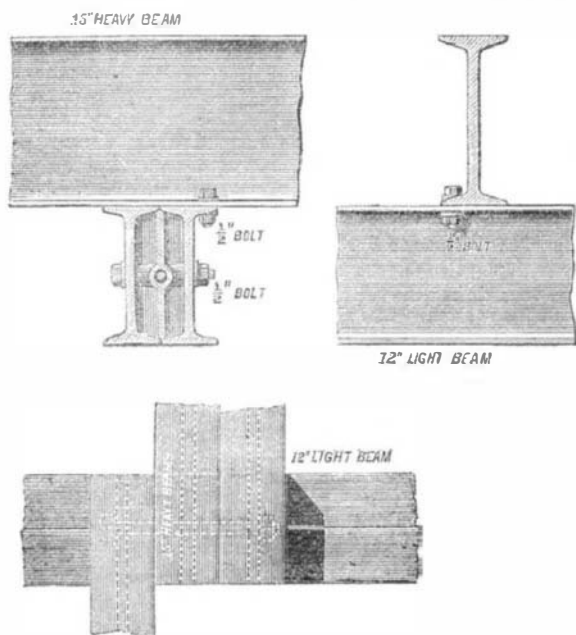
THE UNDERGROUND RAILWAY, NEW YORK CITY.—JOINTS AND COUPLINGS OF THE IRON BEAMS.
